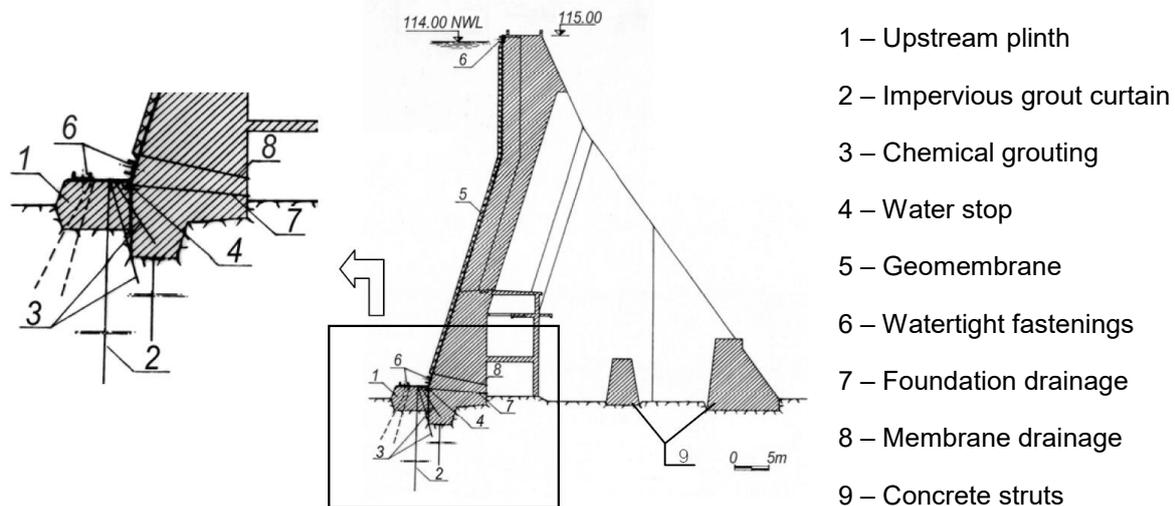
Pracana dam. Global waterproofing system and downstream bracing struts [34]
